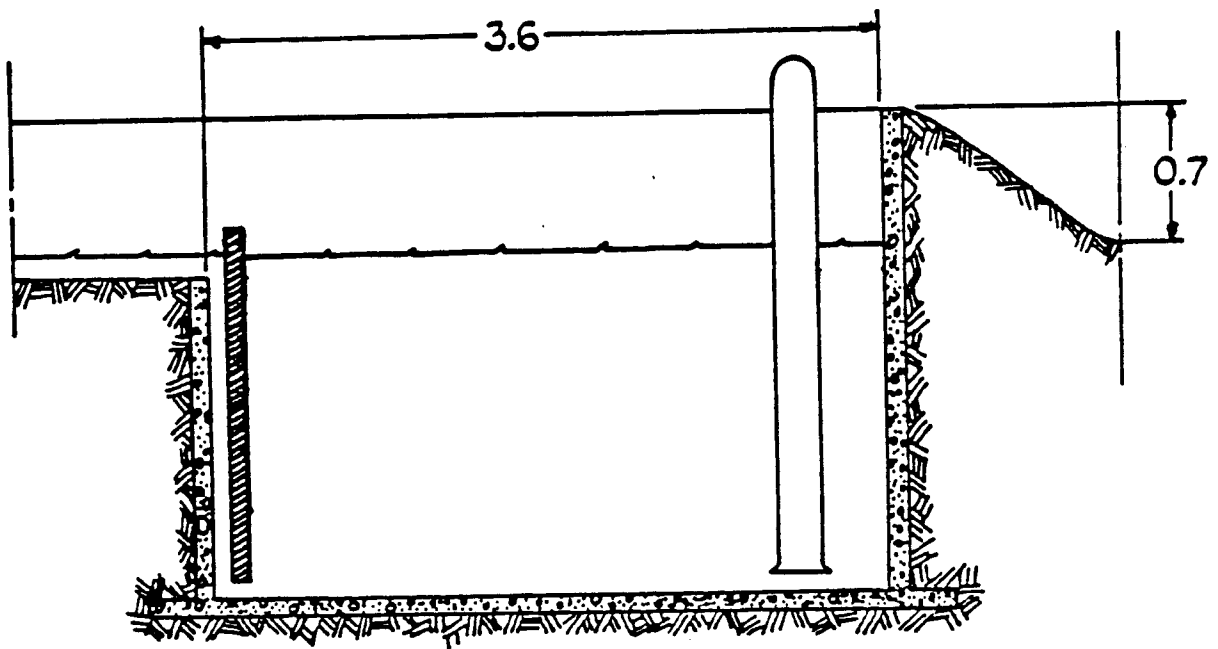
Cutaway side view of raceway pump sump. Dimensions are in meters.
